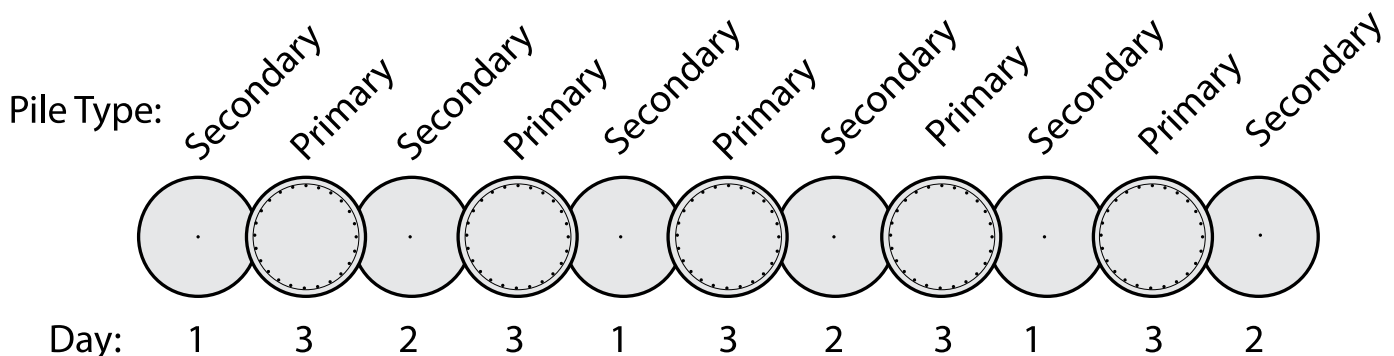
The piles were placed in a sequence that ensured that the primary piles could be drilled into and interlocked with the secondary piles
